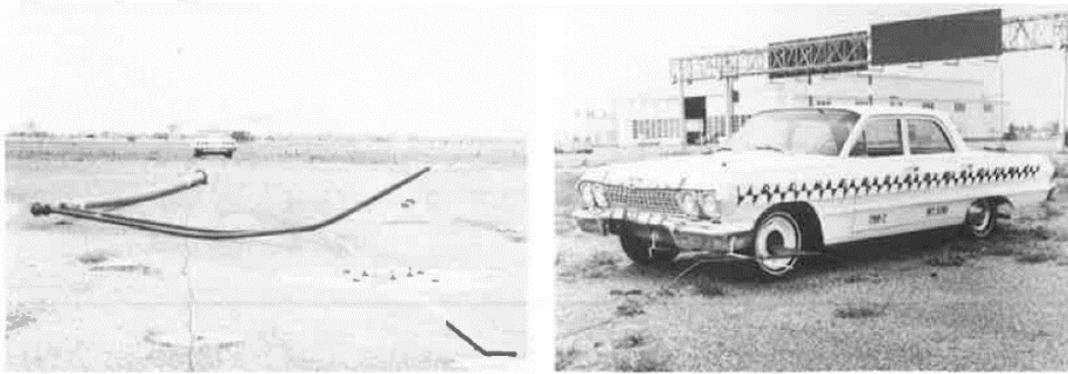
Post-Impact Images of the Vehicle and Assembly (Ninth Test) (4)
